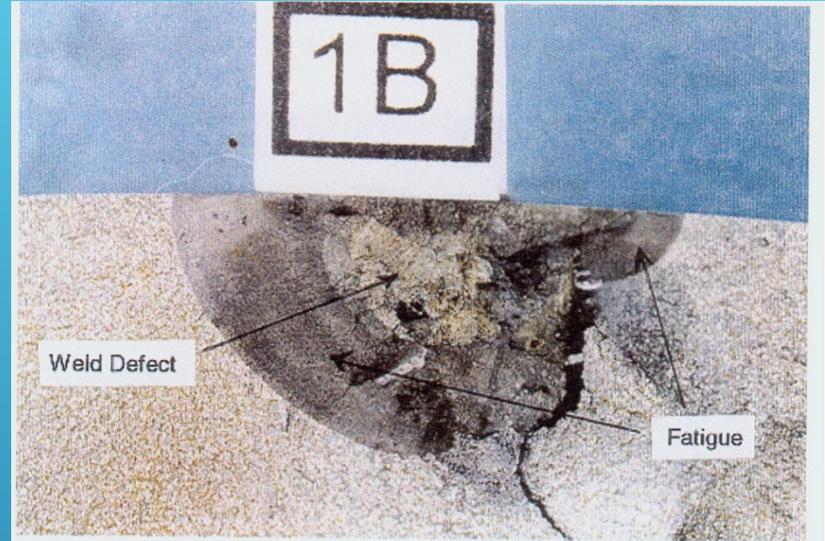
Initial defect at keyway 1B with fatigue crack extension after ultrasonic cleaning. (ATLSS)
